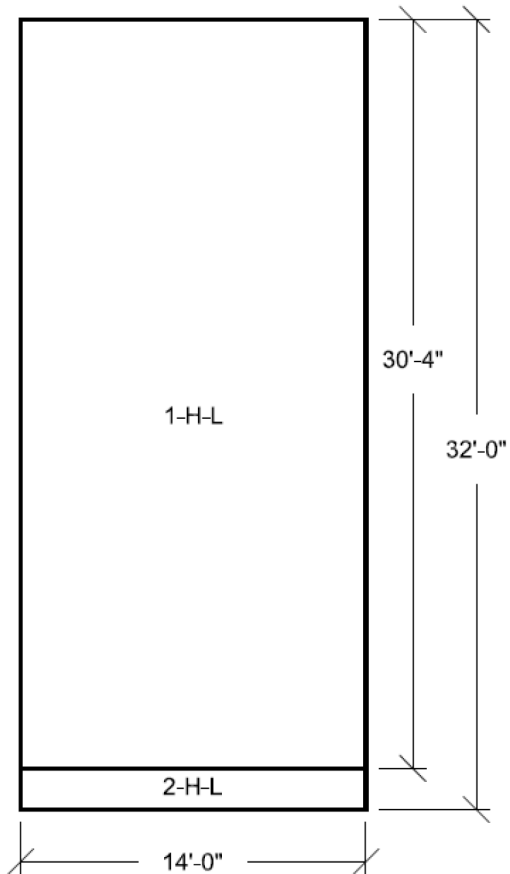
H.6-155 DGFSV Roof 5 Looking Down
